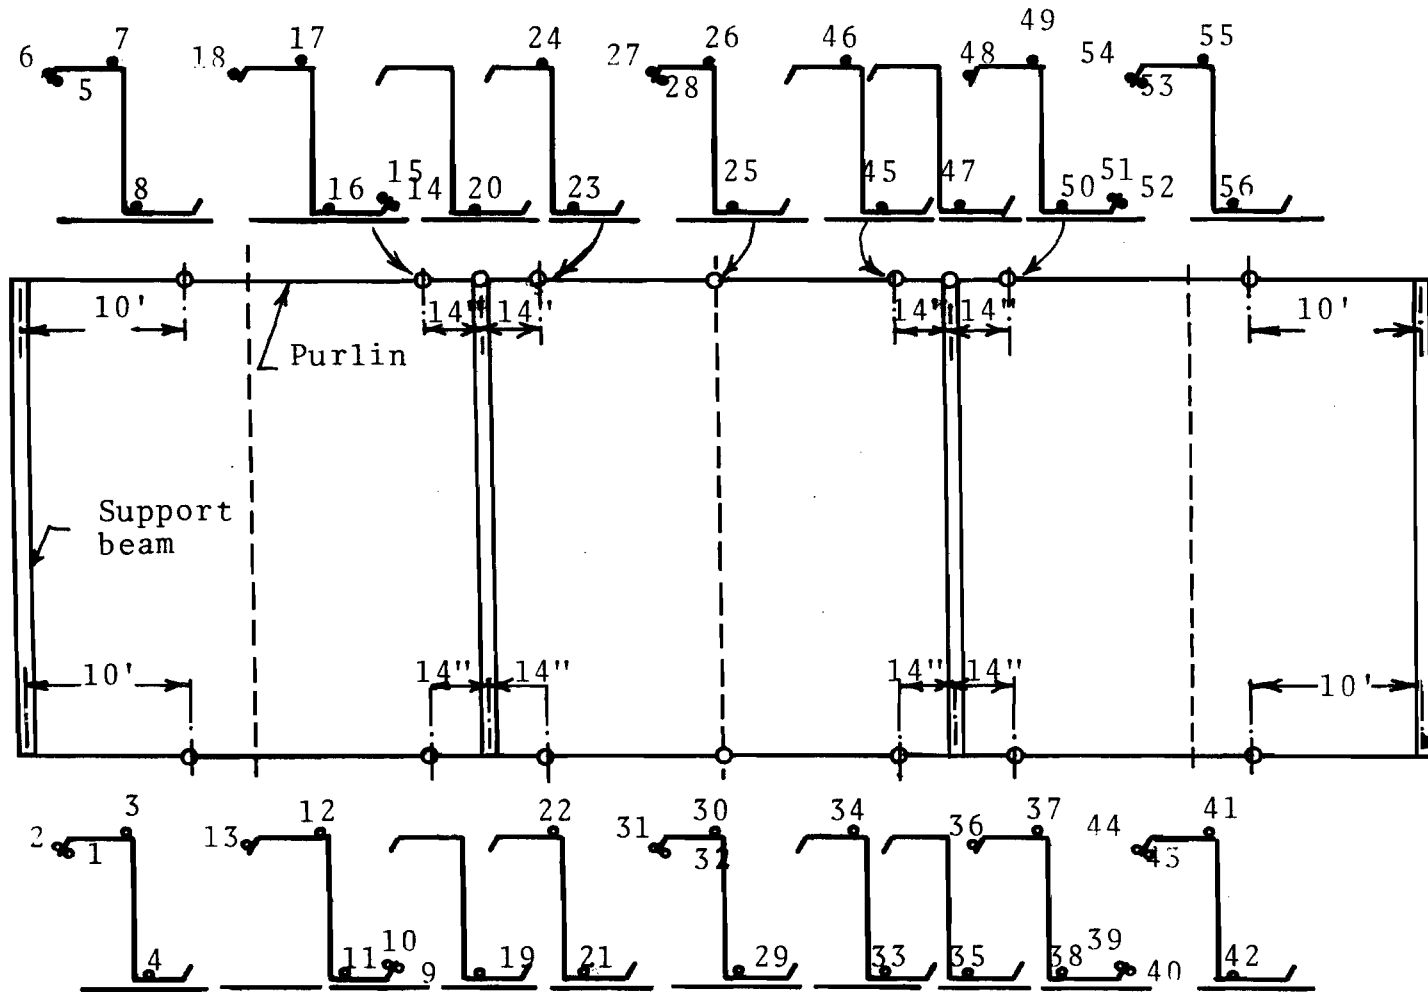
Strain Gage Locations - Second Z-Section Purlin Test
